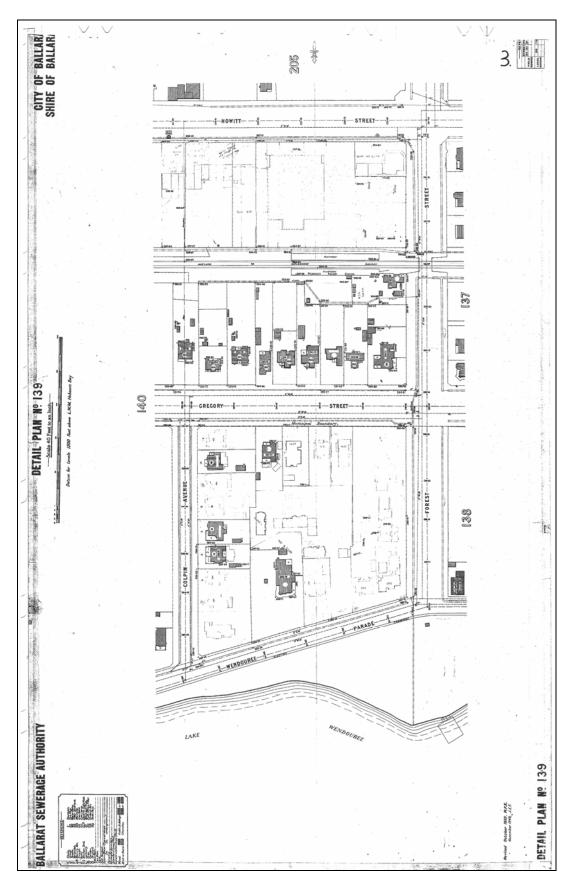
Ballarat Sewerage Authority Plan, 1948. Source: Planning Department, City of Ballarat.
